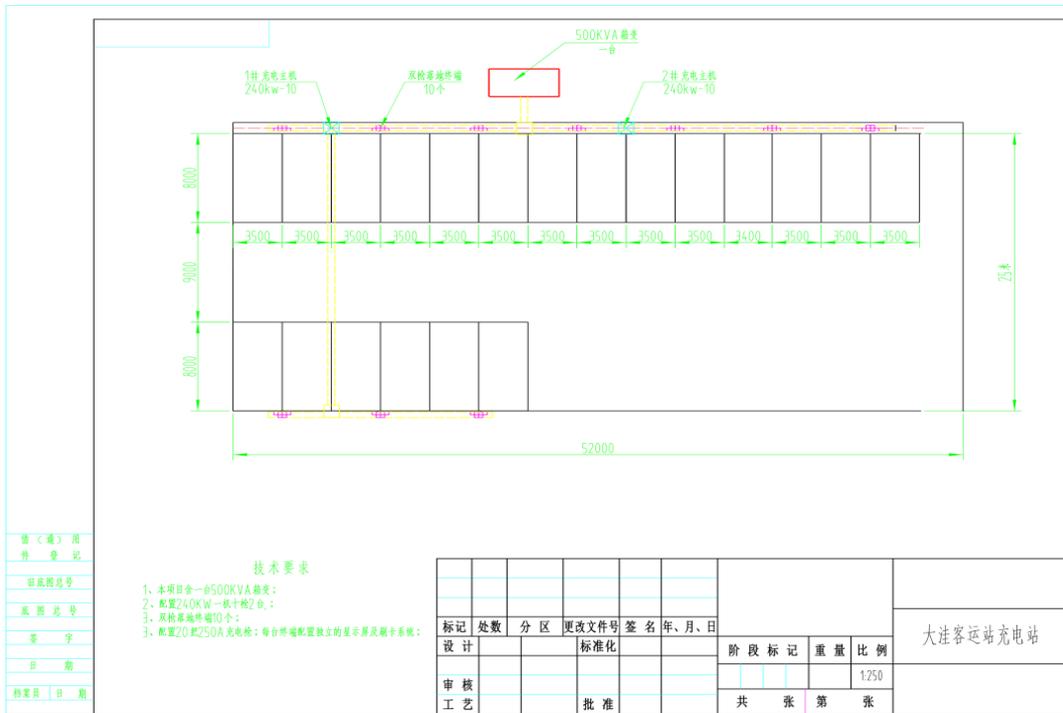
Layout of charging piles at Panjin Dawa Passenger Station
